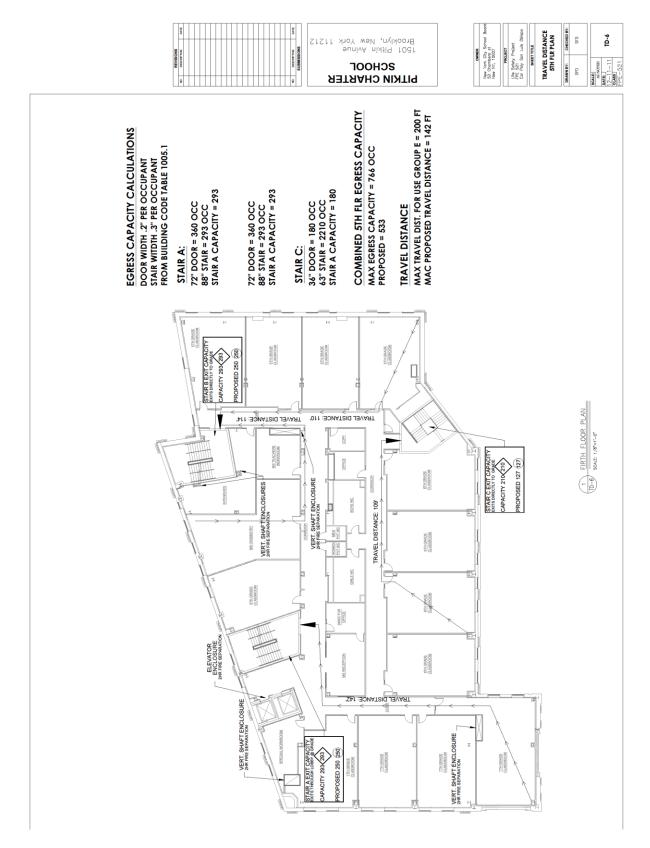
Egress Calculation and Egress paths Fifth floor plan
